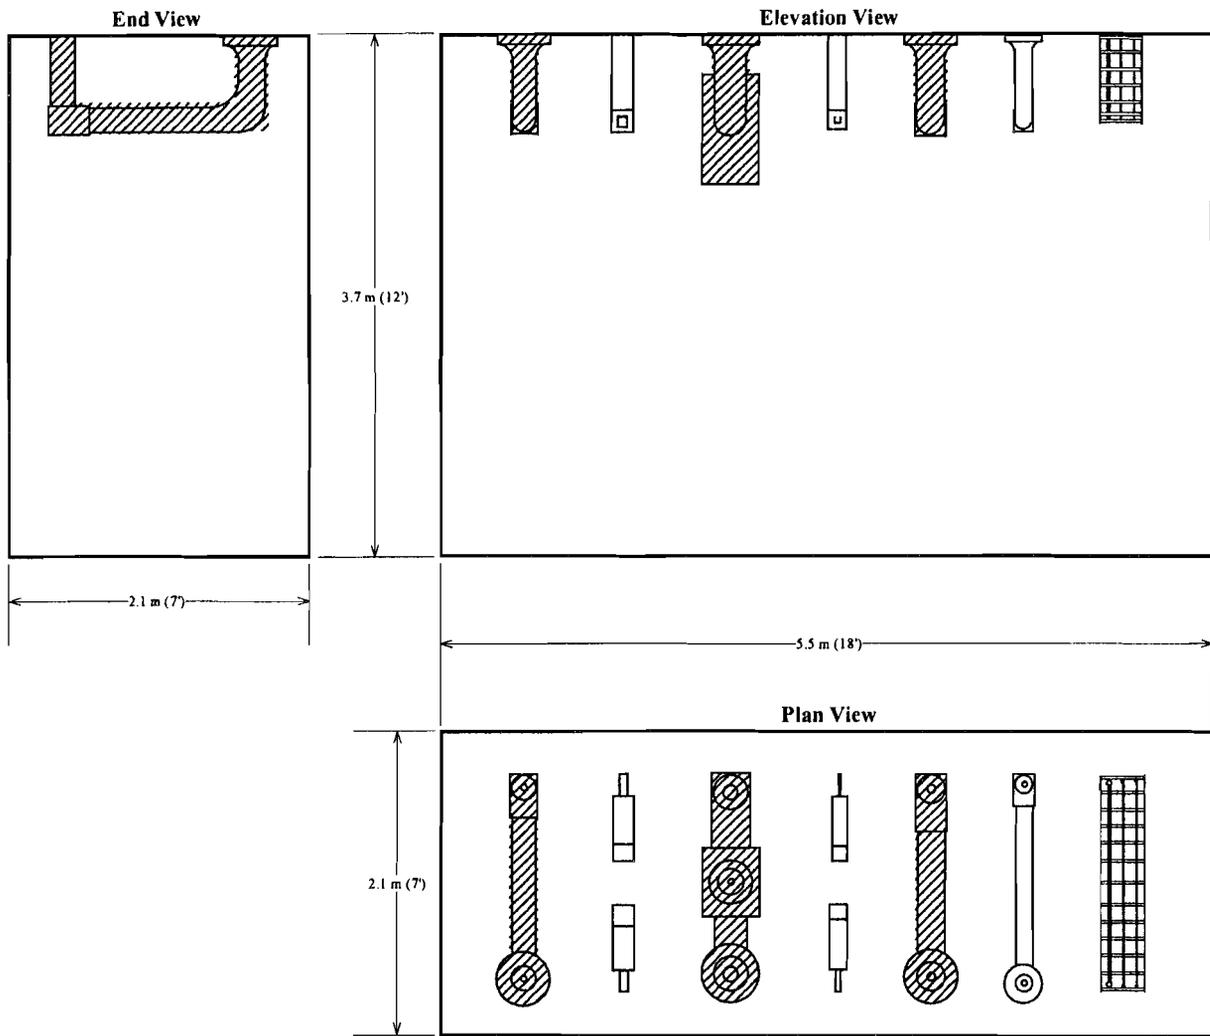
Test Specimen Layout for Test 3. Note that the shaded elements represent the test specimens protected with the M.T. fire wrap. Unshaded elements are enclosed in Hemyc fire wrap. The Firezone R fire rated cables will be installed in an unprotected, open cable tray.
